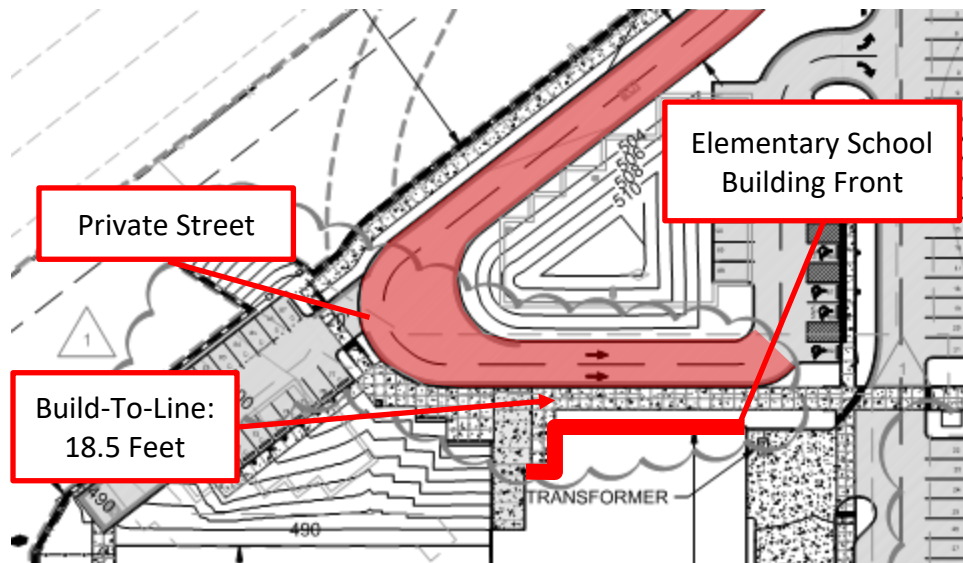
Elementary School Build-To-Line. Annotations by Staff. Source: ISD (Attachment 97, Sheet C1.0LU – Civil Plans).
